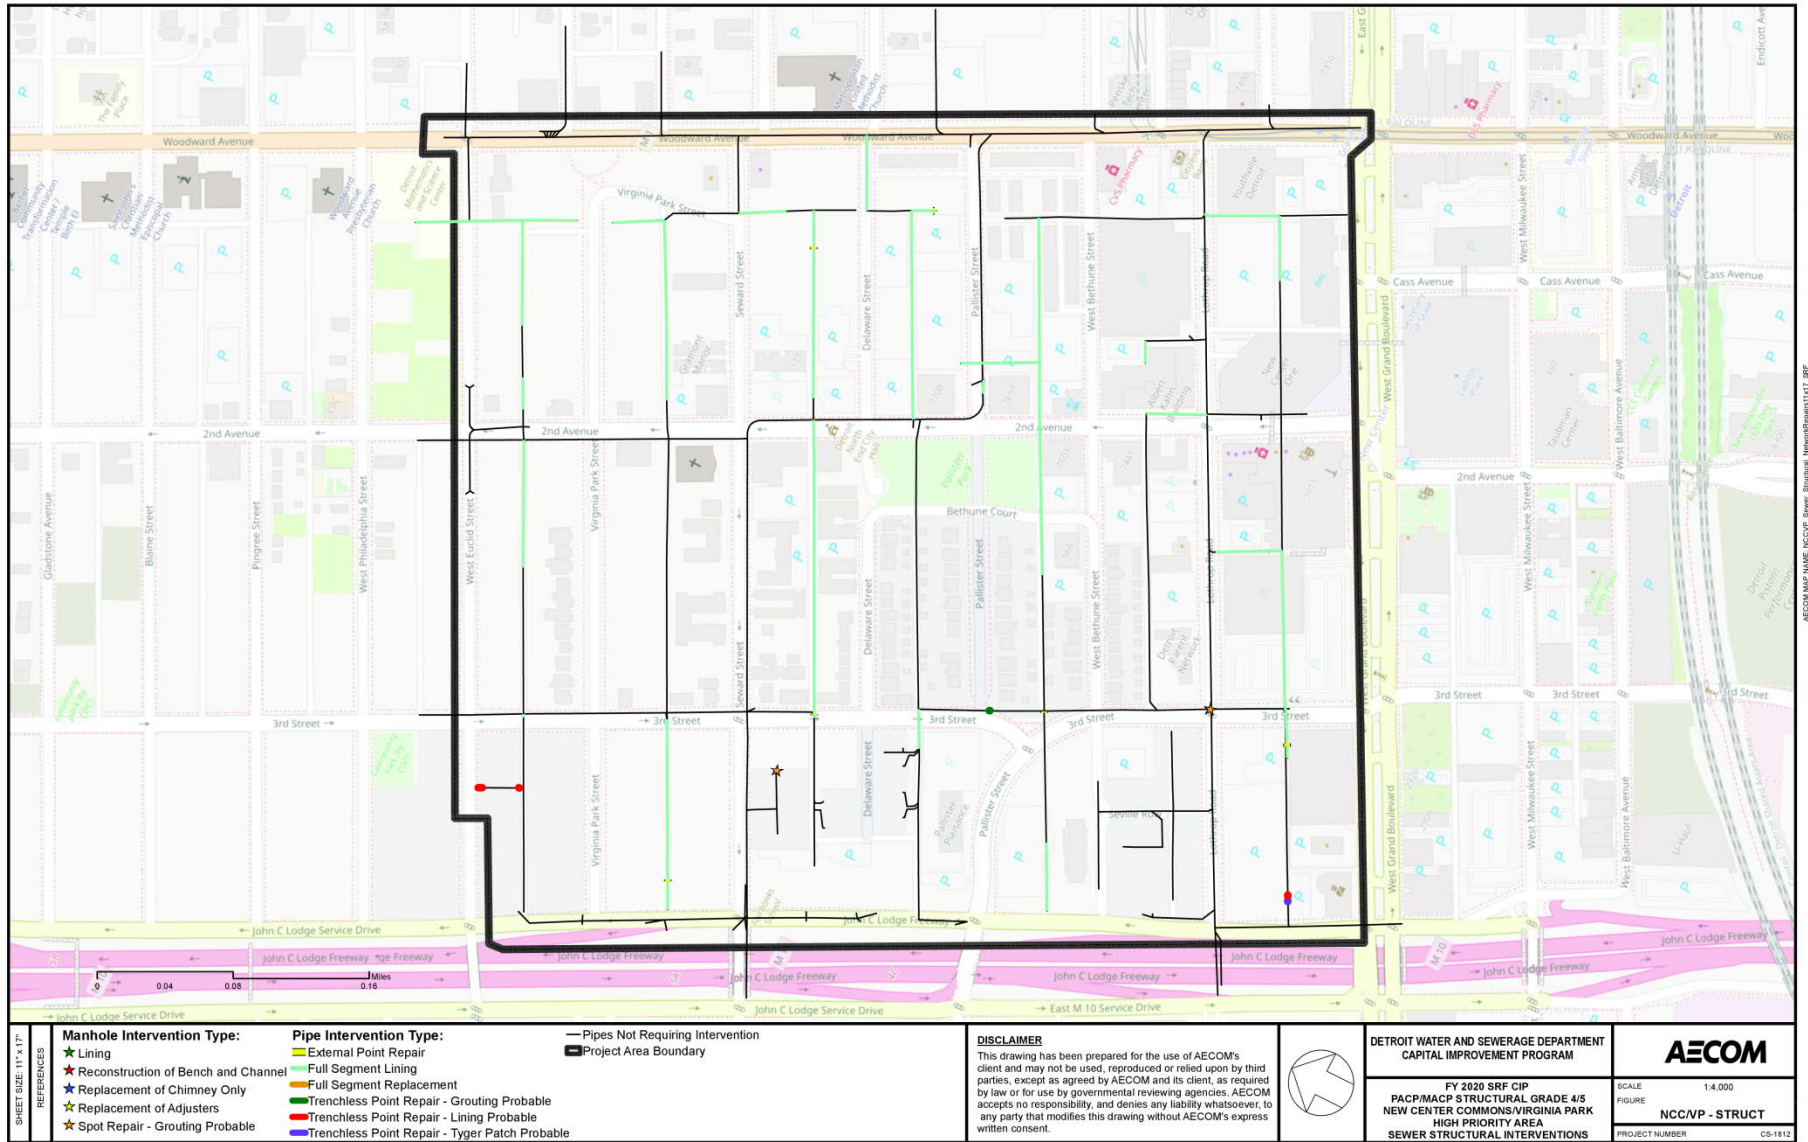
New Center Commons/Virginia Park Sewer Structural Network Repairs 11x17
